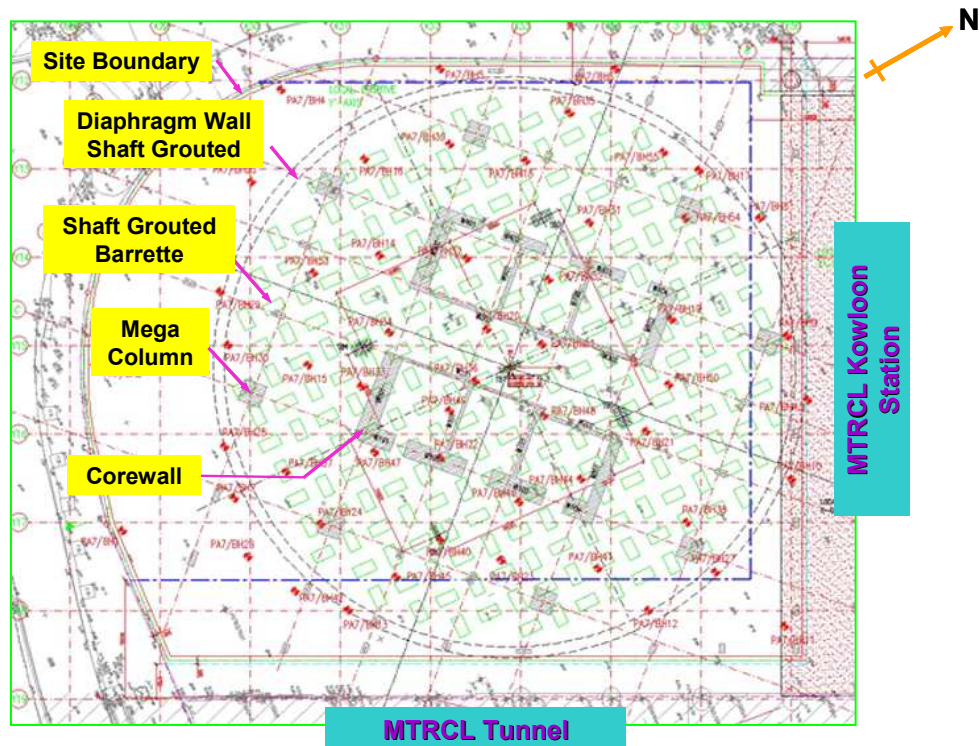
Plan of the barrettes and circular diaphragm wall at the ICC, Kowloon
